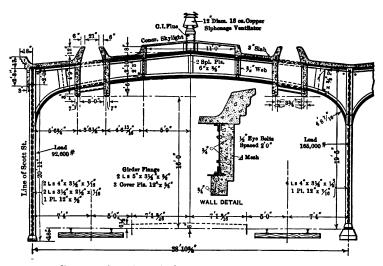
Cross-section of Typical Bay — Eye Bolts Used in Wall Detail. L. V. Train Shed at Buffalo.
